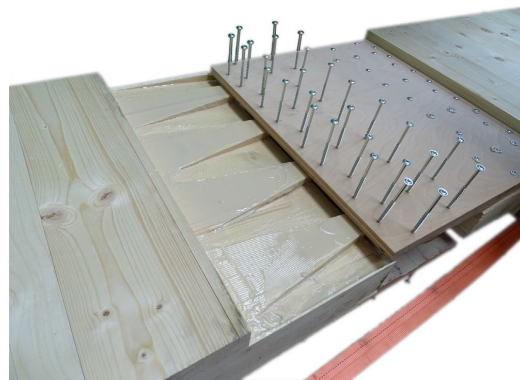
Assembly of developed CLT edge joint with profiled beech LVL gusset plates (here alternative B) showing the adhesive spread and the mounted self-tapping partially threaded screws used for cramping
